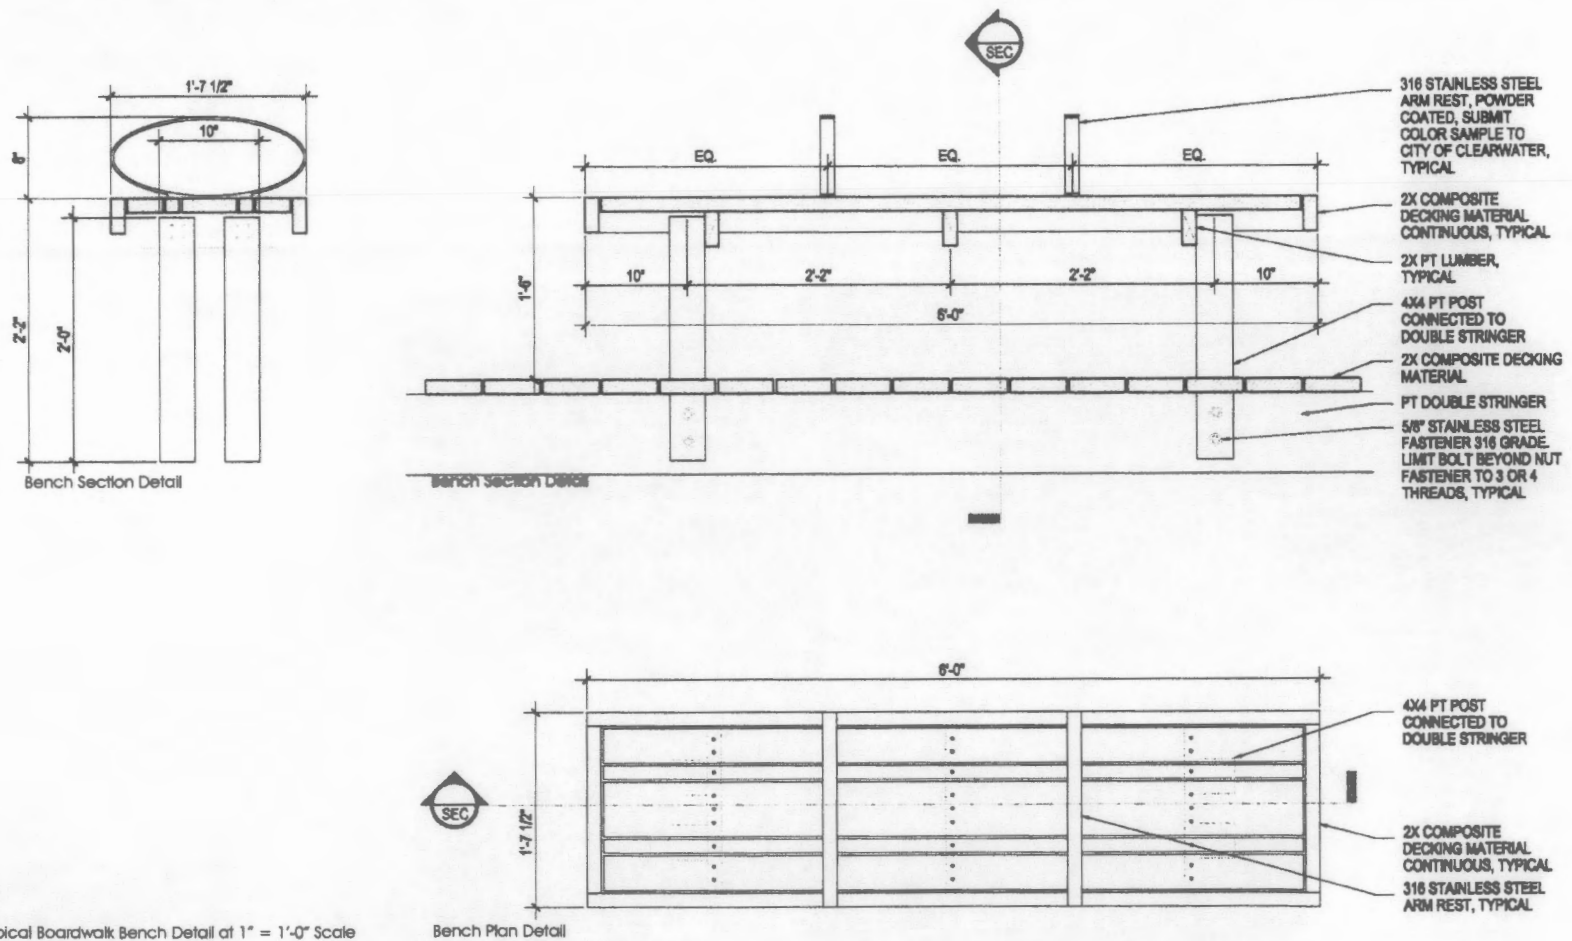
Typical Boardwalk Bench Detail at 1" = 1'-0" Scale
